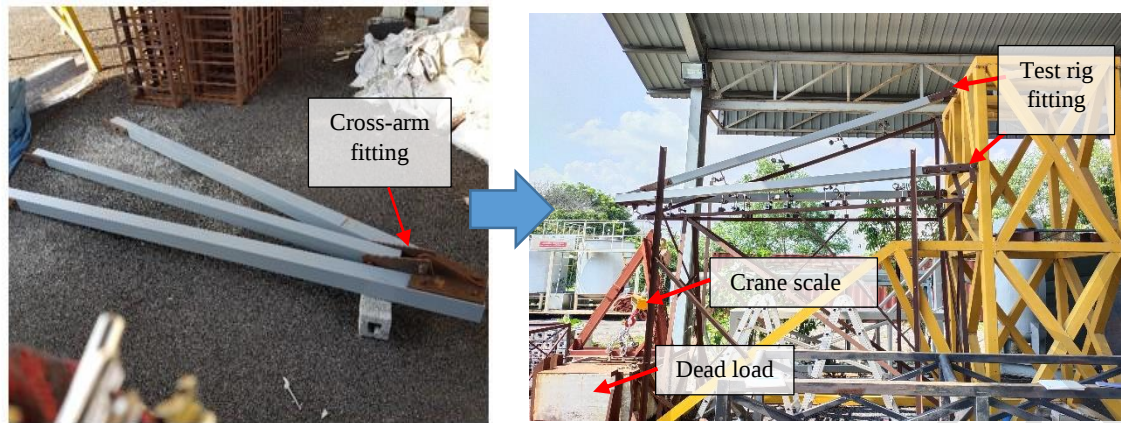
Assemble and mounting the cross-arm onto the test rig.
